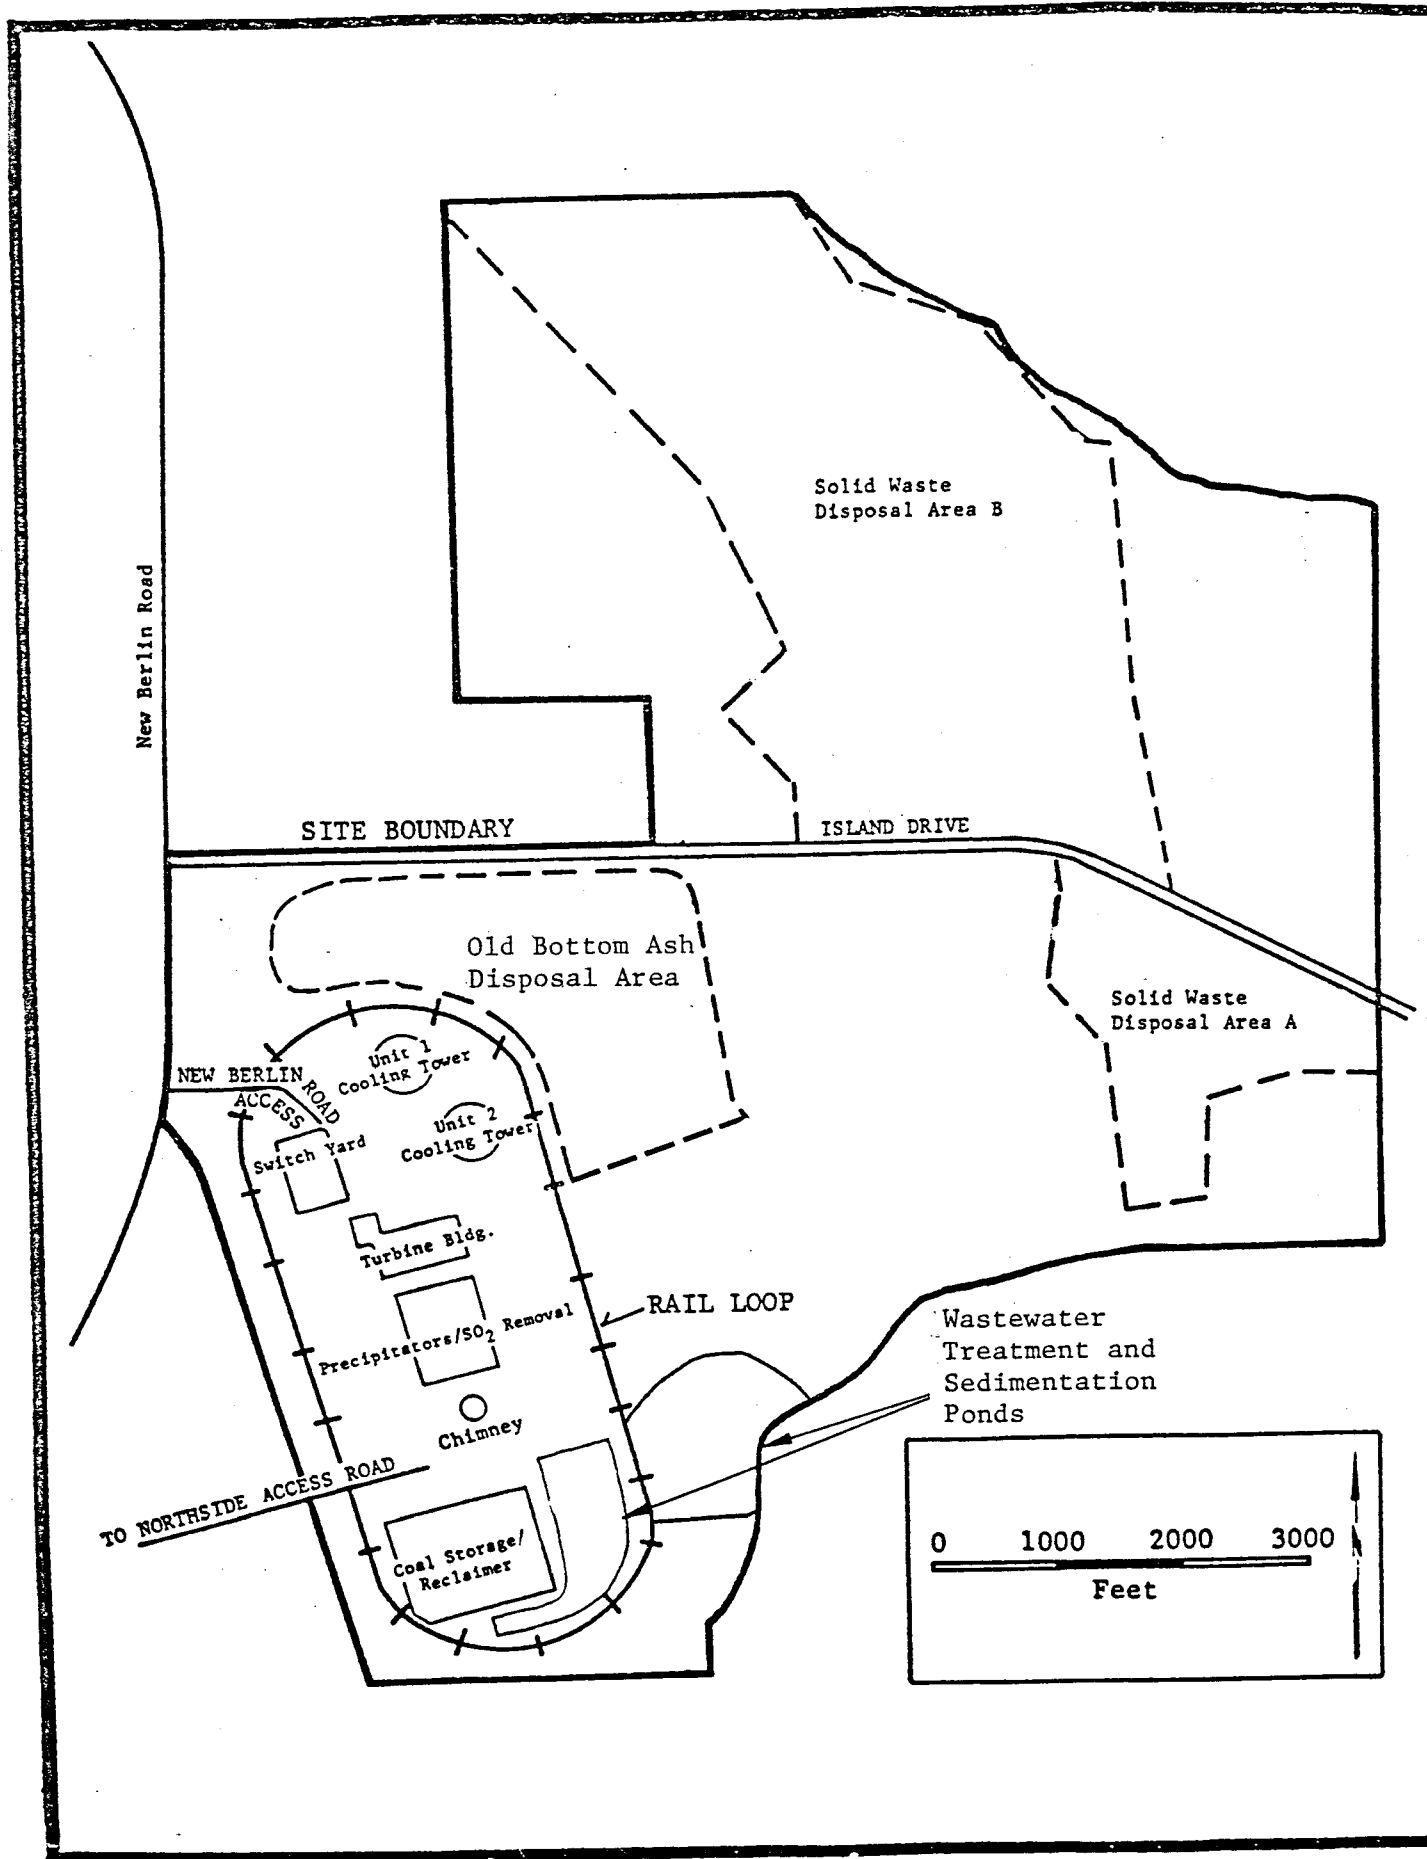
General layout of the proposed SJRPP and associated facilities (adapted from JEA/FP&L 1981a).
